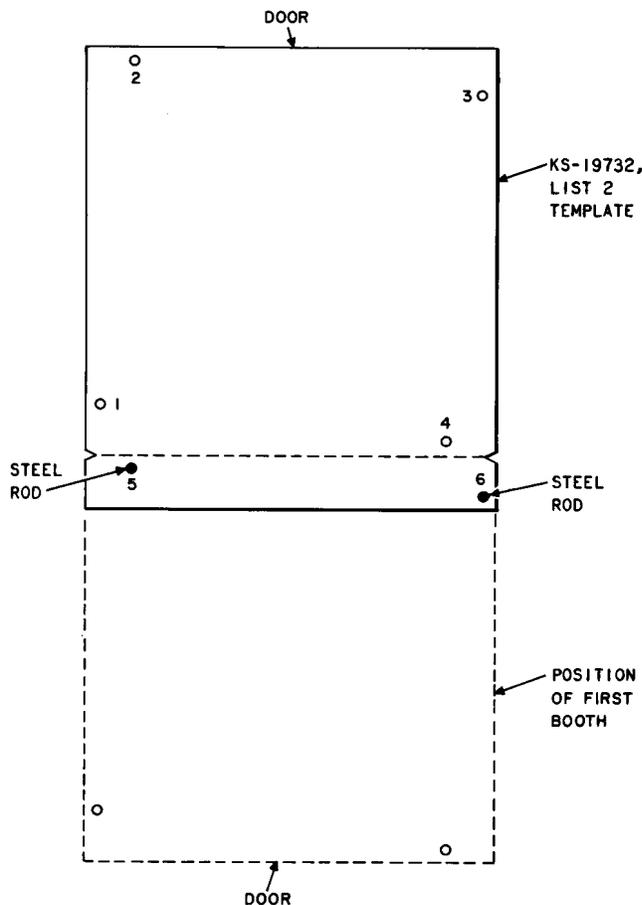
Back-to-Back Layout for Drilling Mounting Holes
